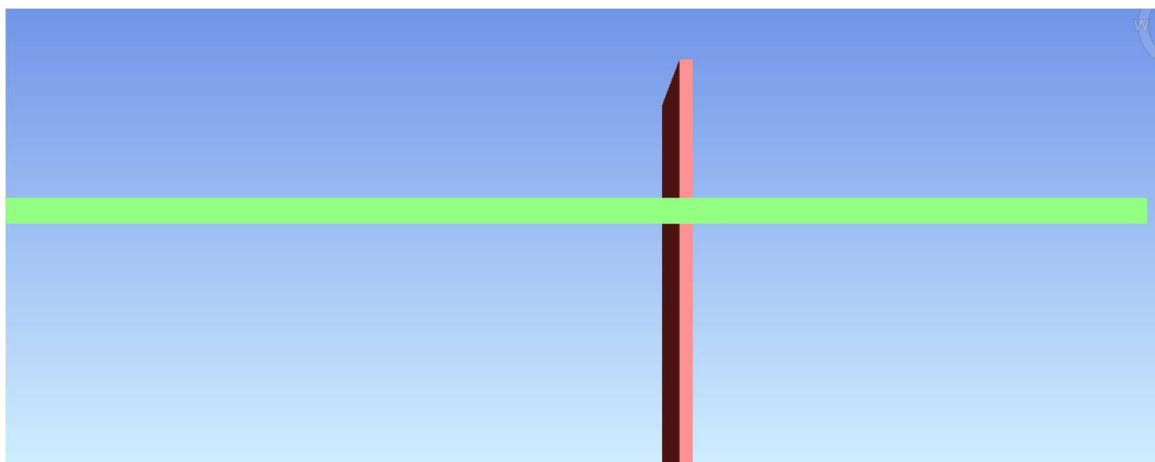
High Clash of Architectural wall (Element ID 2193) vs Structural beam (Element ID 166402) - Top View
